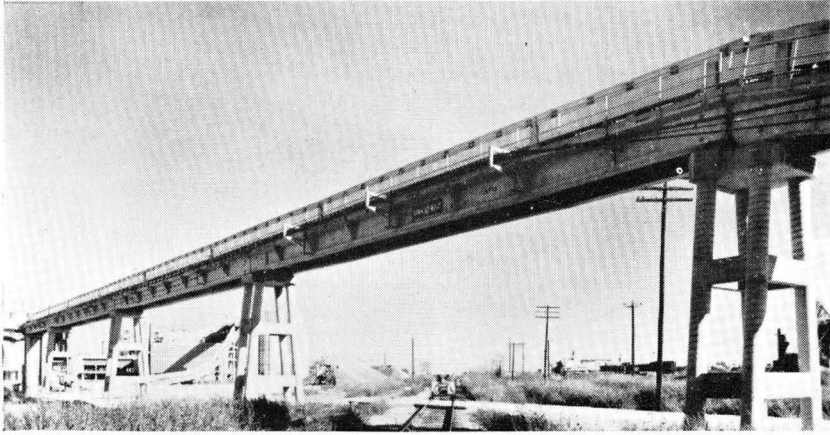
Concrete Structure for Conveyor passing over Railway.
